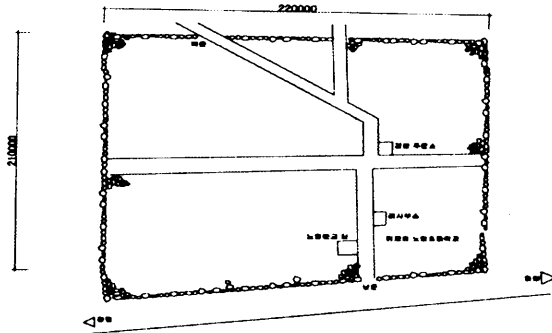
A site plan of wall surrounded 4.3 rebel's village
